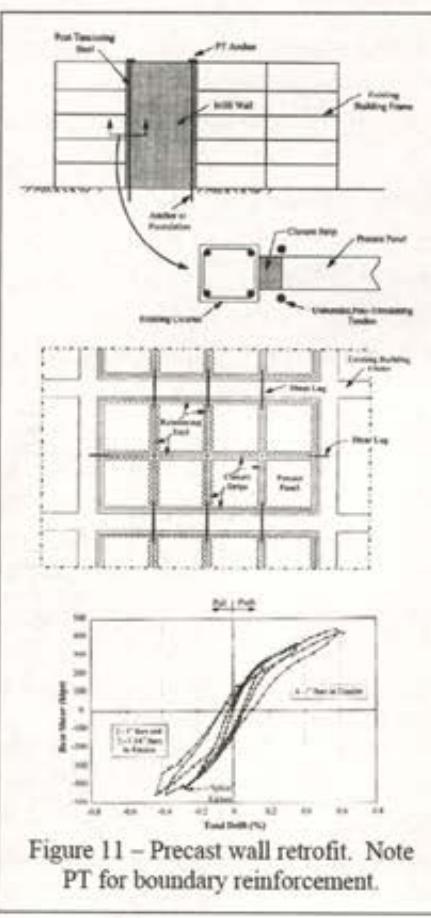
Precast wall retrofit. Note PT for boundary reinforcement.
